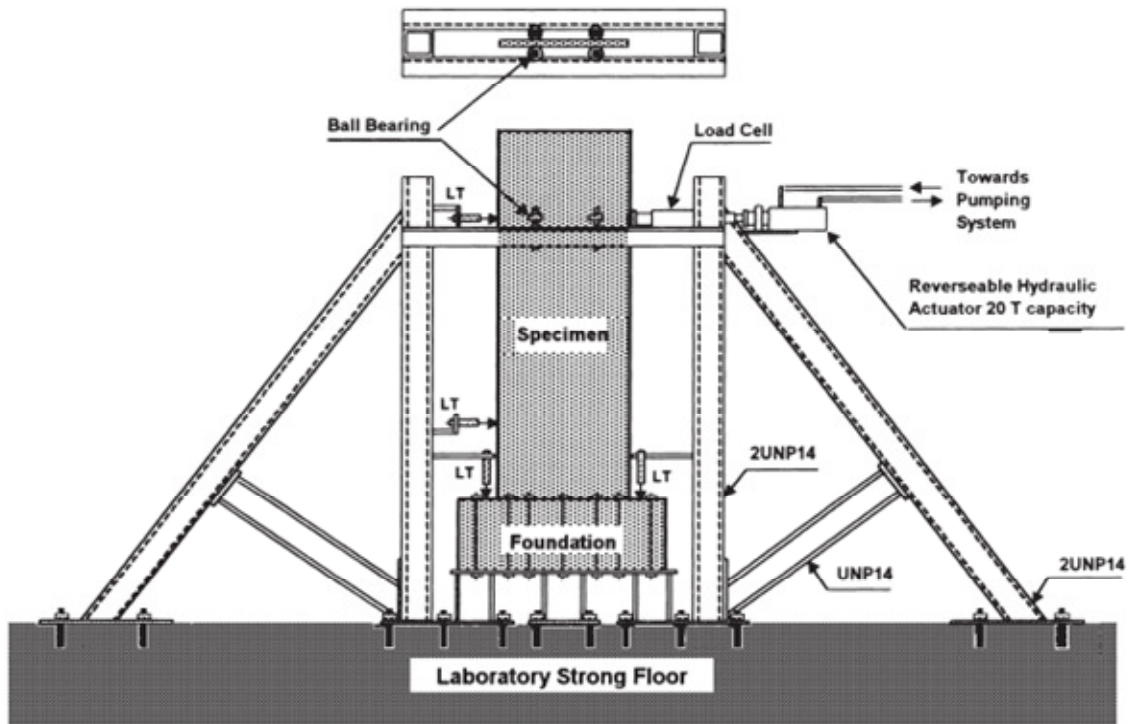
Test setup used for wall test by Tasnimi (2000)
